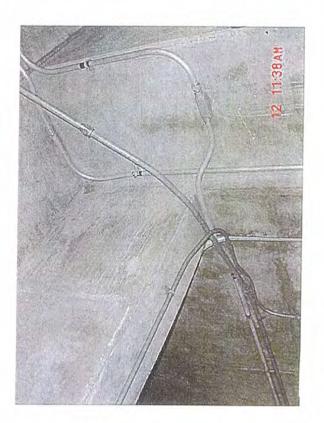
Interior Concrete Walls/Roof Slab Bluebird3.jpg 12/12/2002 (Thu), 1:38 PN
